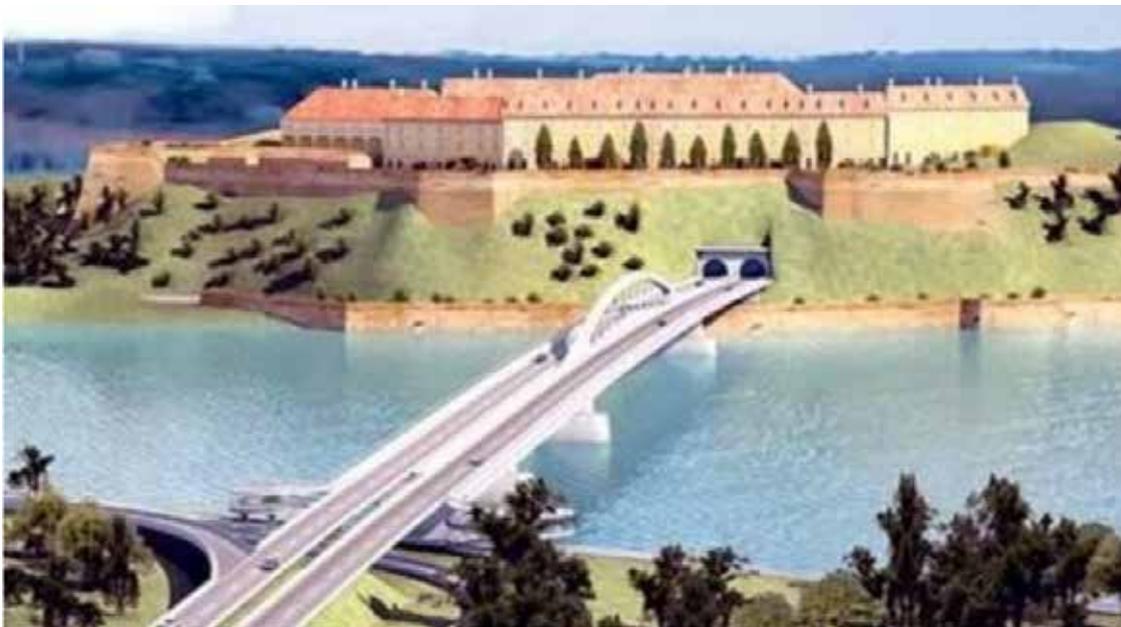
New bridge and tunnel through Petrovaradin Fortress (Source: Jevdjenic, 2013)
